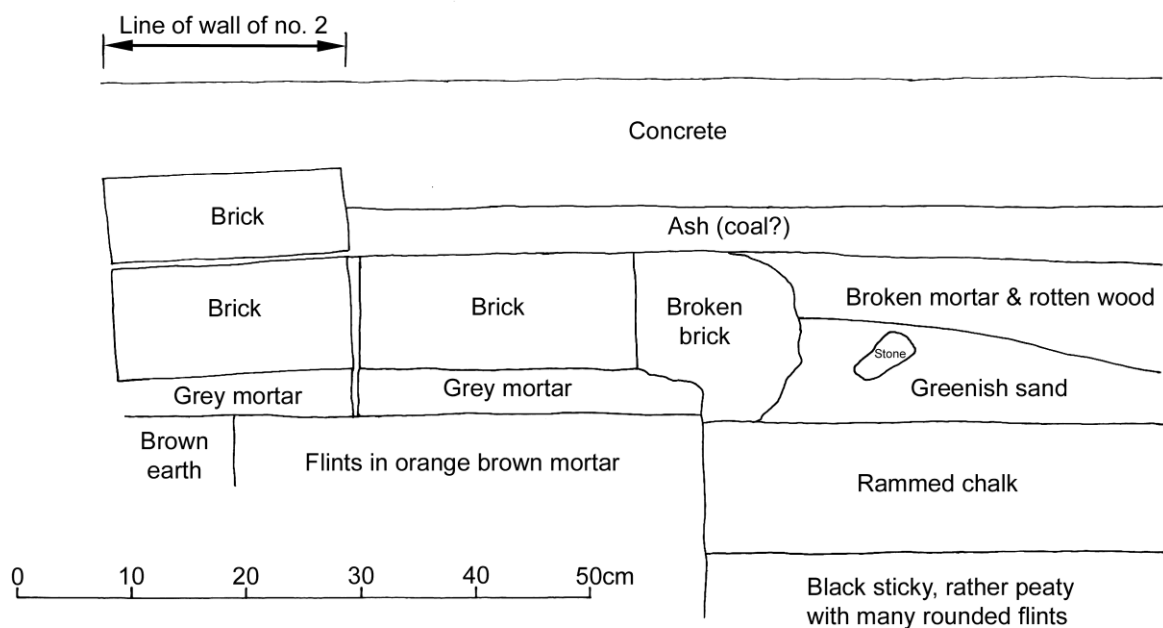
Section through the foundations of the west wall of cottage 2 looking north.
